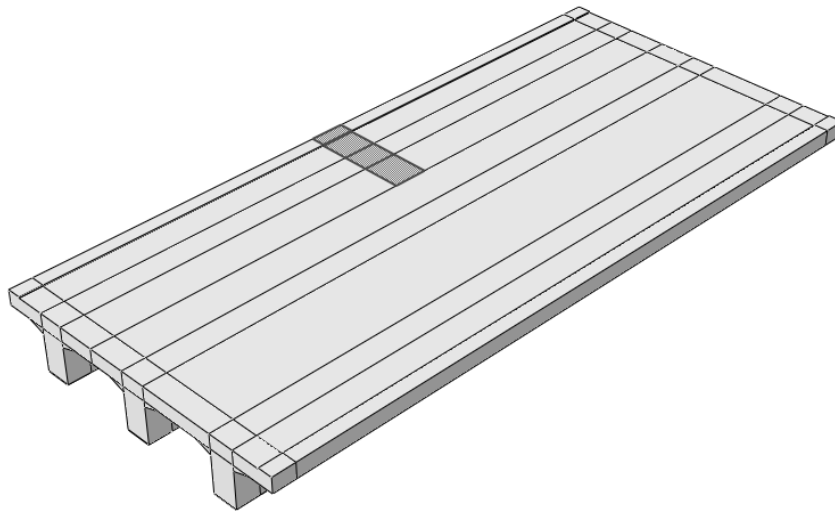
Highlighted loading area (1875 mm × 600 mm) on T-beam bridge
